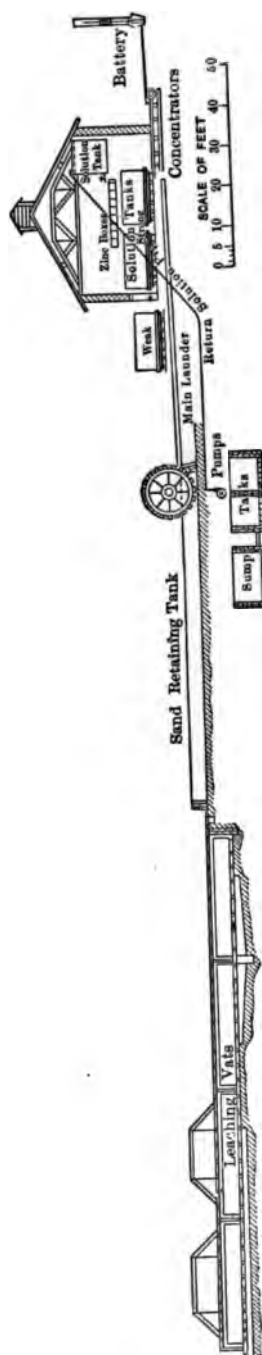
CYANIDE LEACHING PLANT, ELEVATION.
